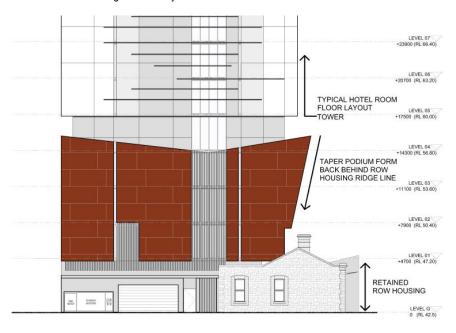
View indicating the tapering podium form from a workable hotel room floor layout to the row housing.
